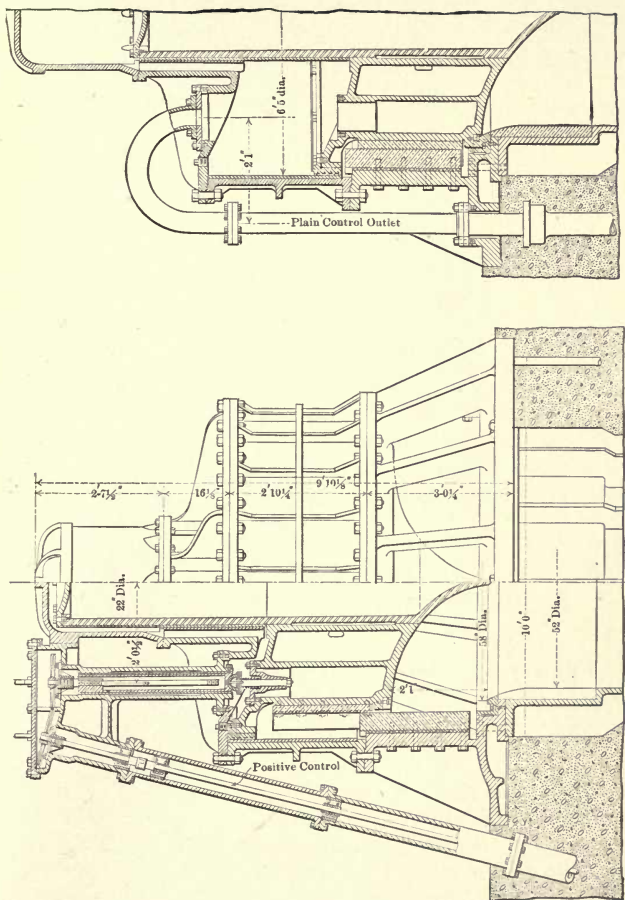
Section of Balanced Valve, Arrowrock Dam, Boise River, Idaho.
